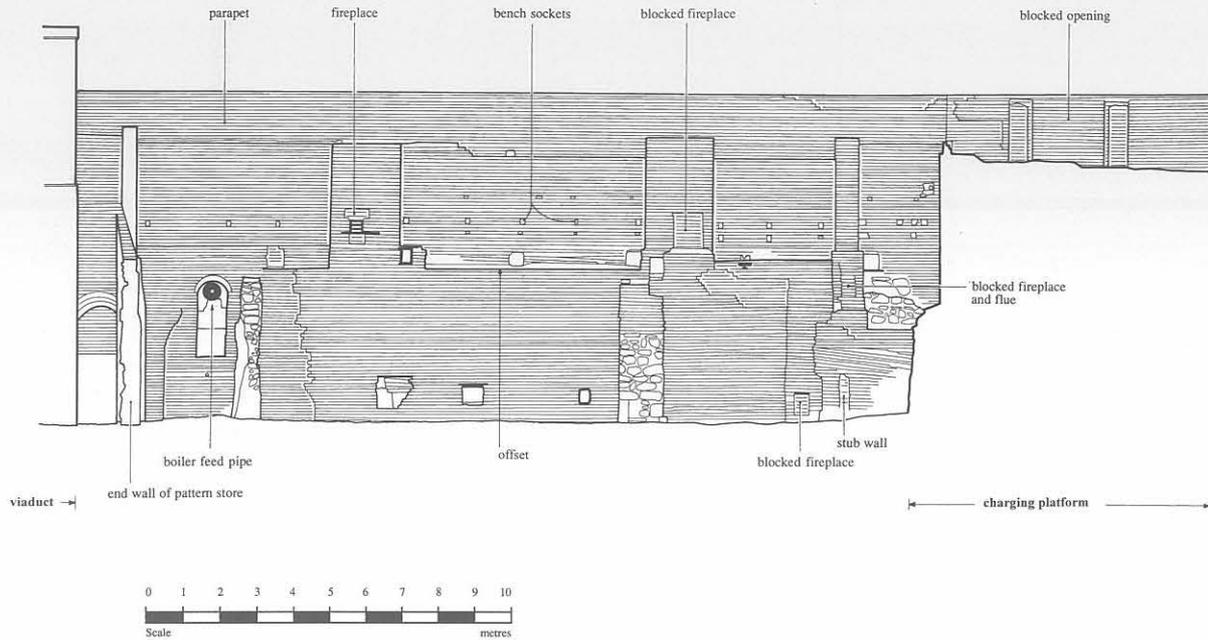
South face of the dam wall on the west side of the charging platform. Discrete areas of early rubble-stone wall can be seen behind the brick skin, which forms the side wall of a fitting shop built between 1838 and 1847.
